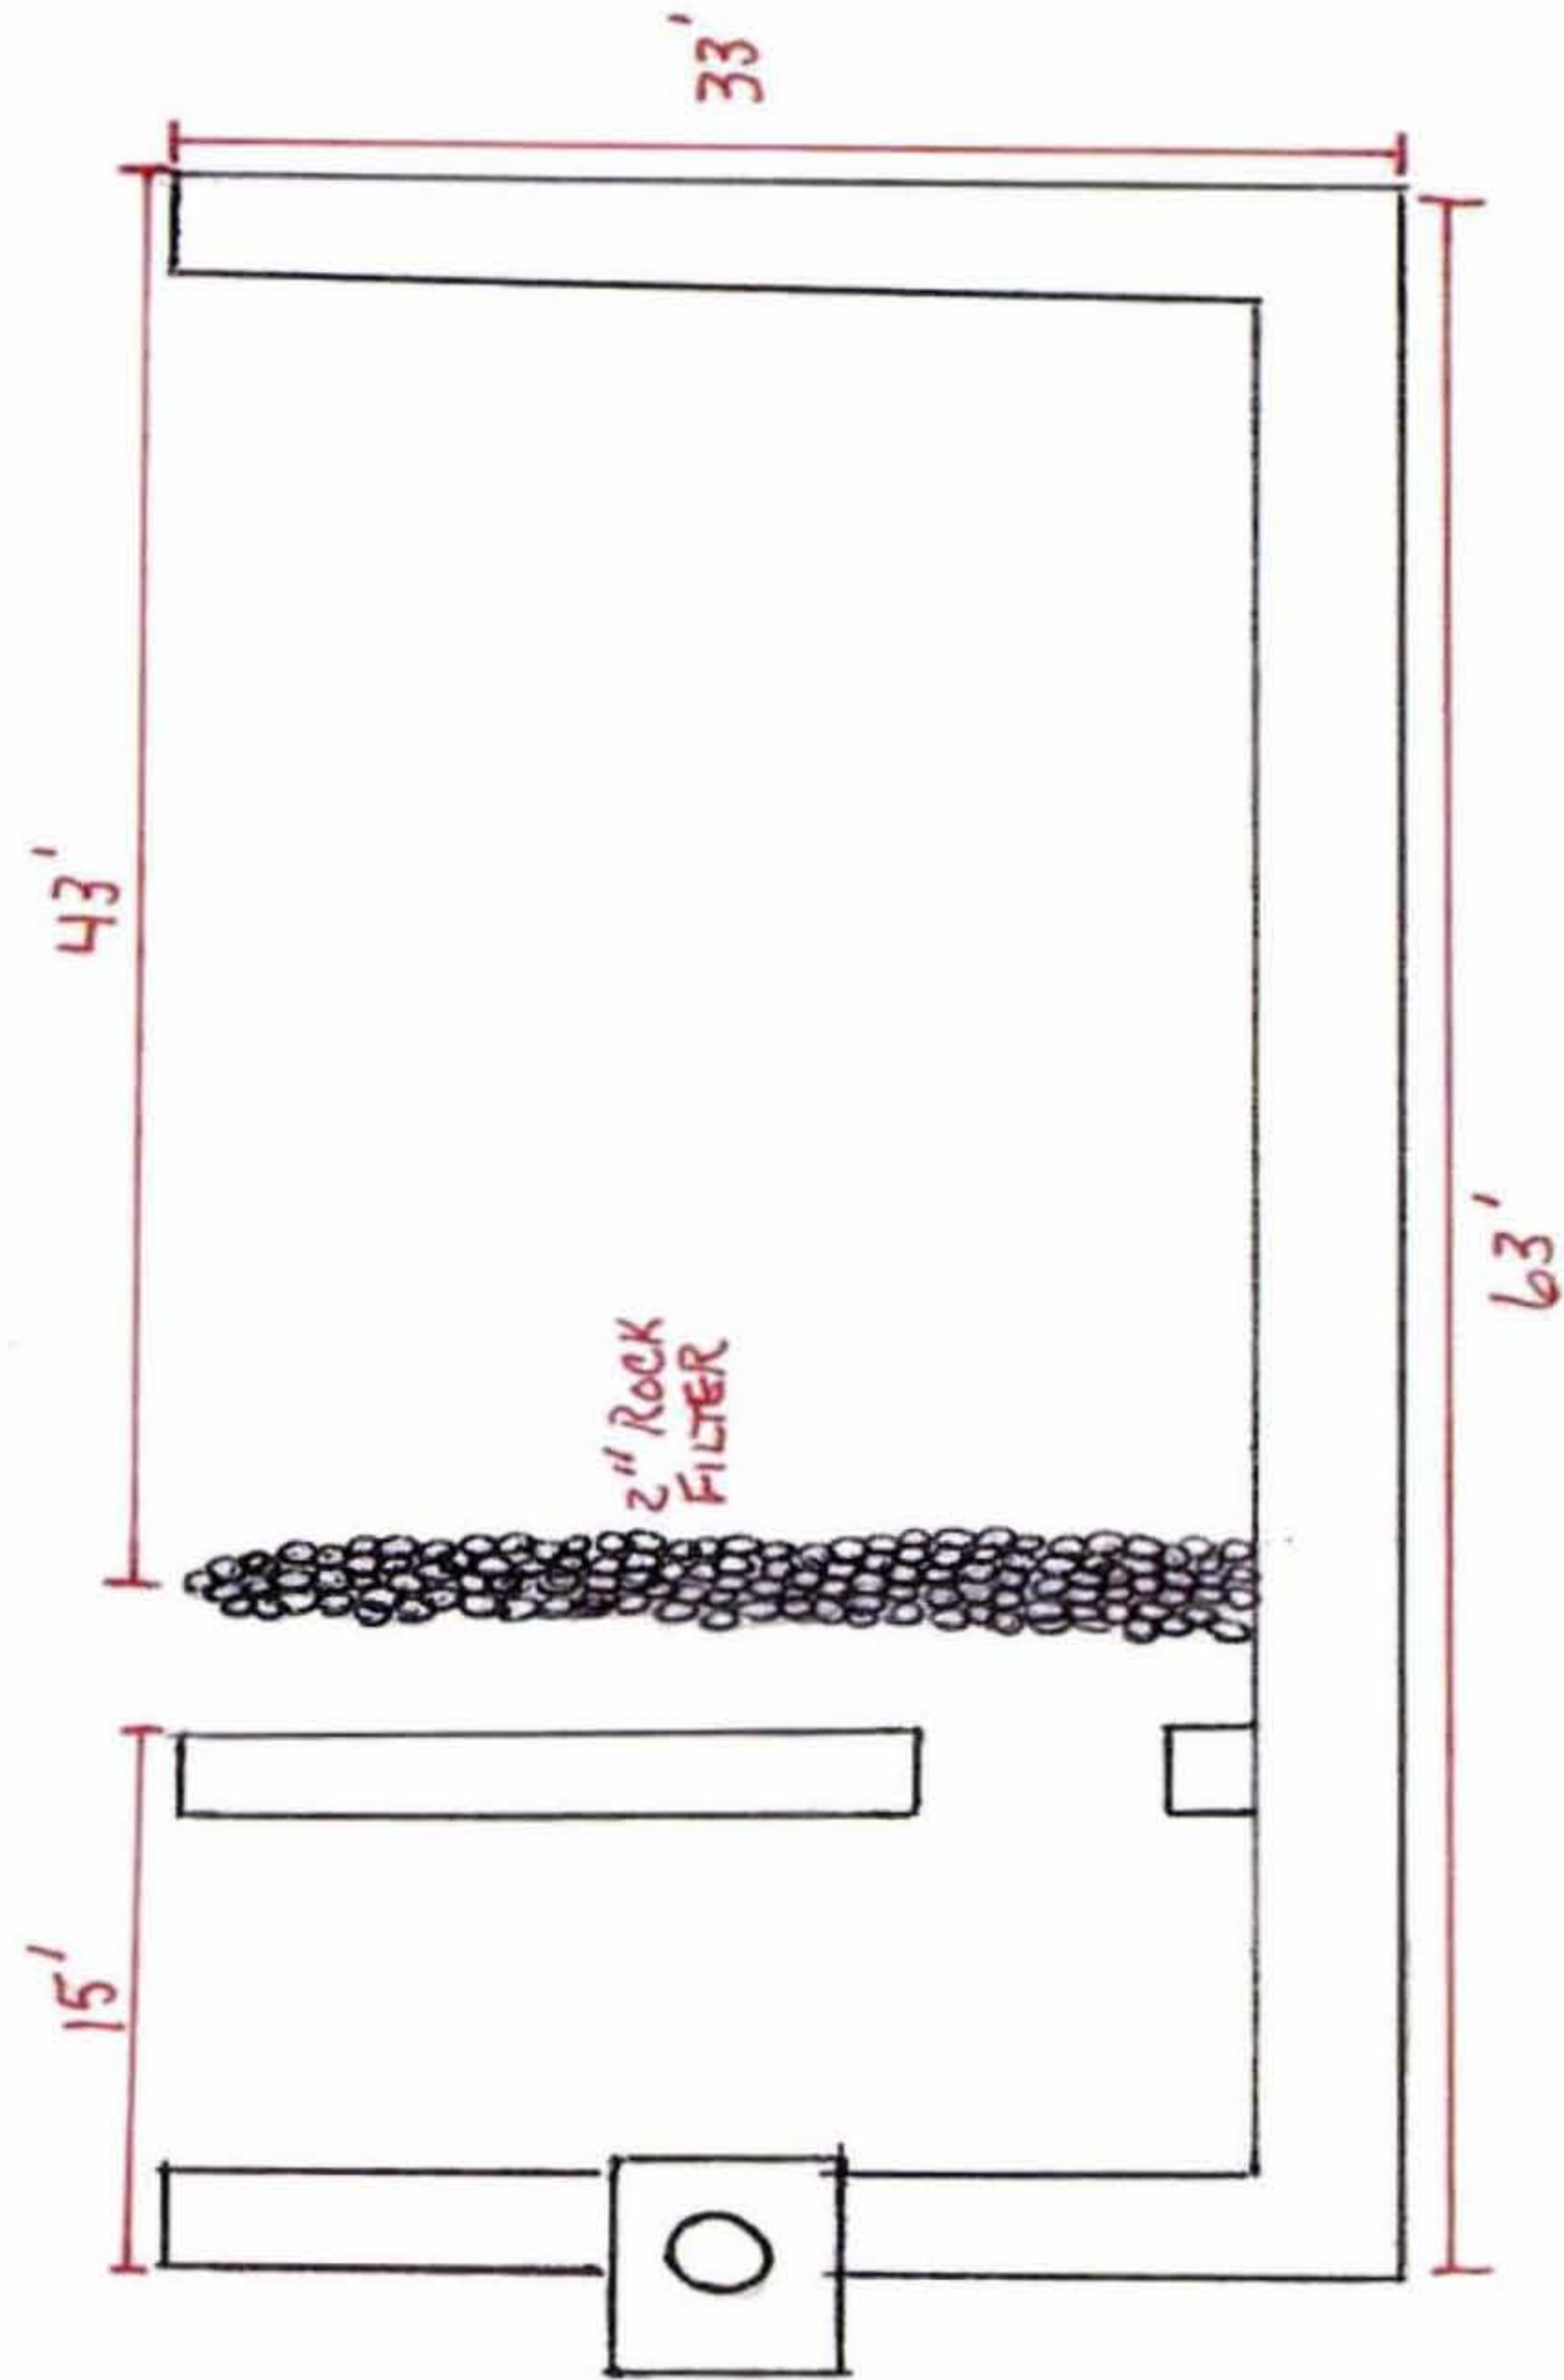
Adams Street Decant Basin Plan View (sketch by Jeff Brockett/ ACHD 2006)
